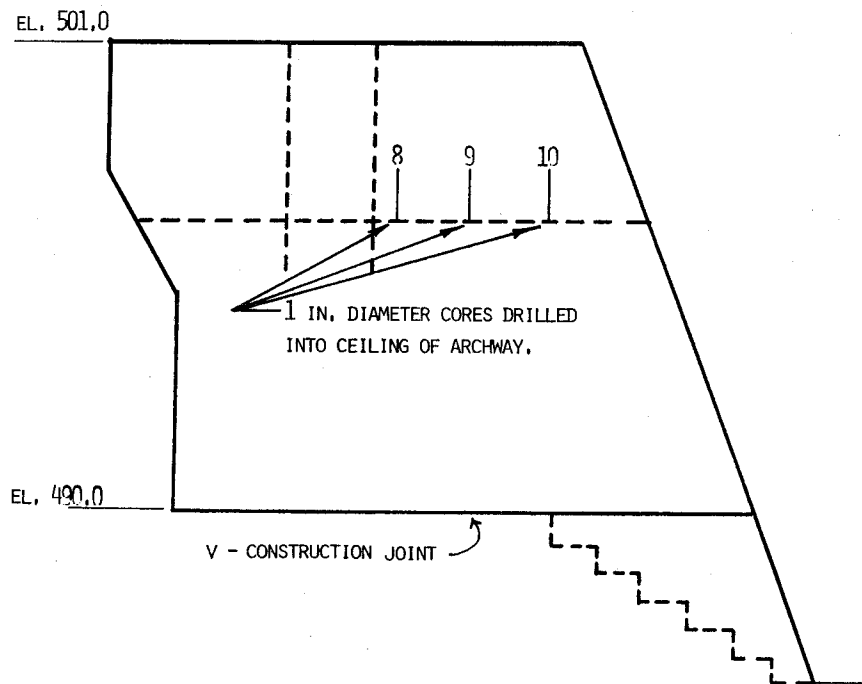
East elevation showing location of injection ports (Flock and Walleaser, 1983).
